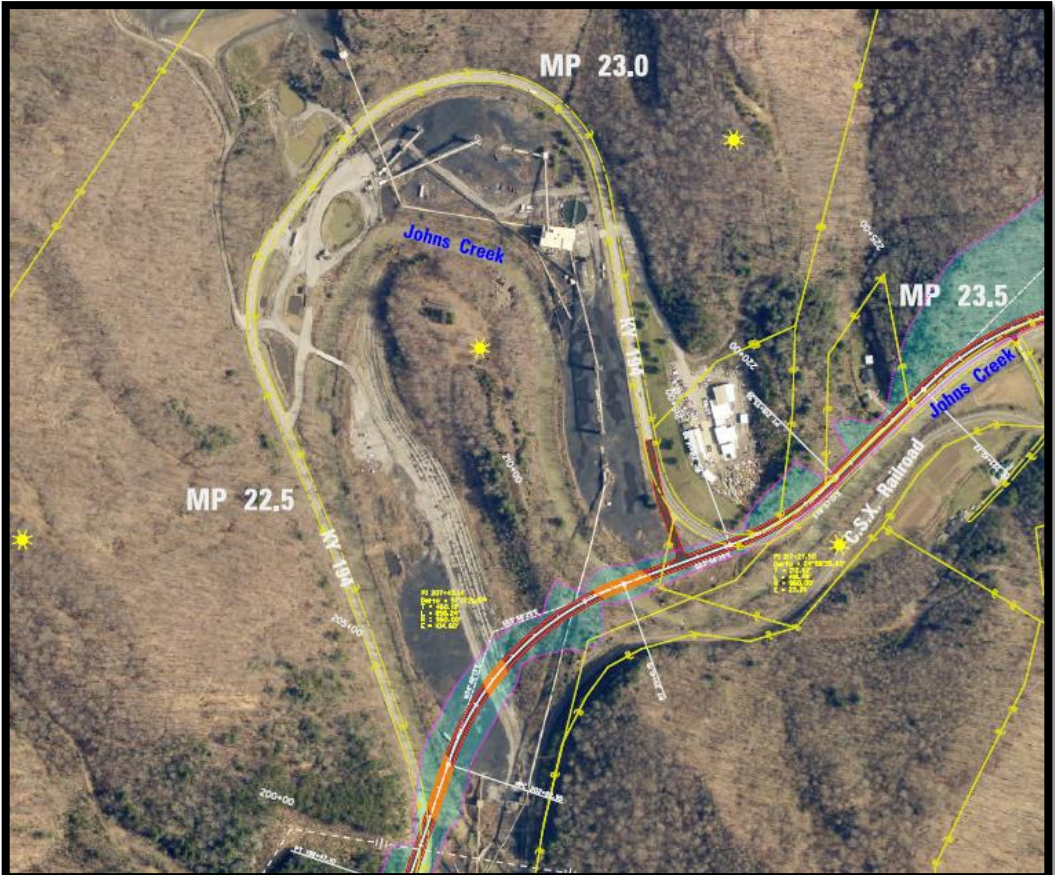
Plan view of Section 2 Alternative 1 at High Ridge Mining MP 22.5
